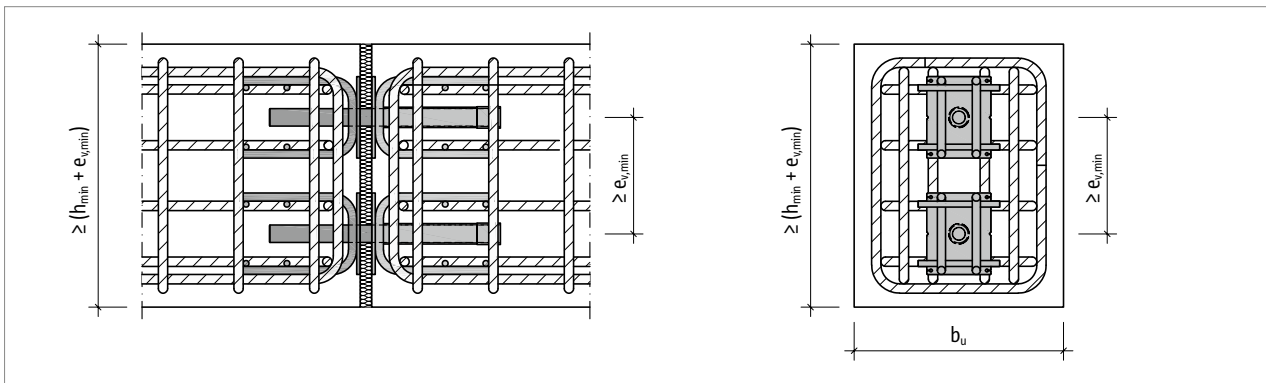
Schöck Stacon® type SLD: on-site reinforcement with beam connection
